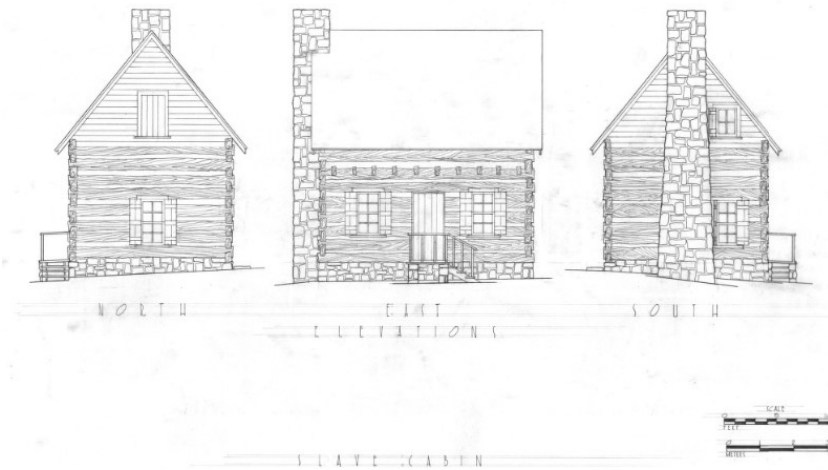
Elevation drawings of a slave cabin at White Oak Plantation.
